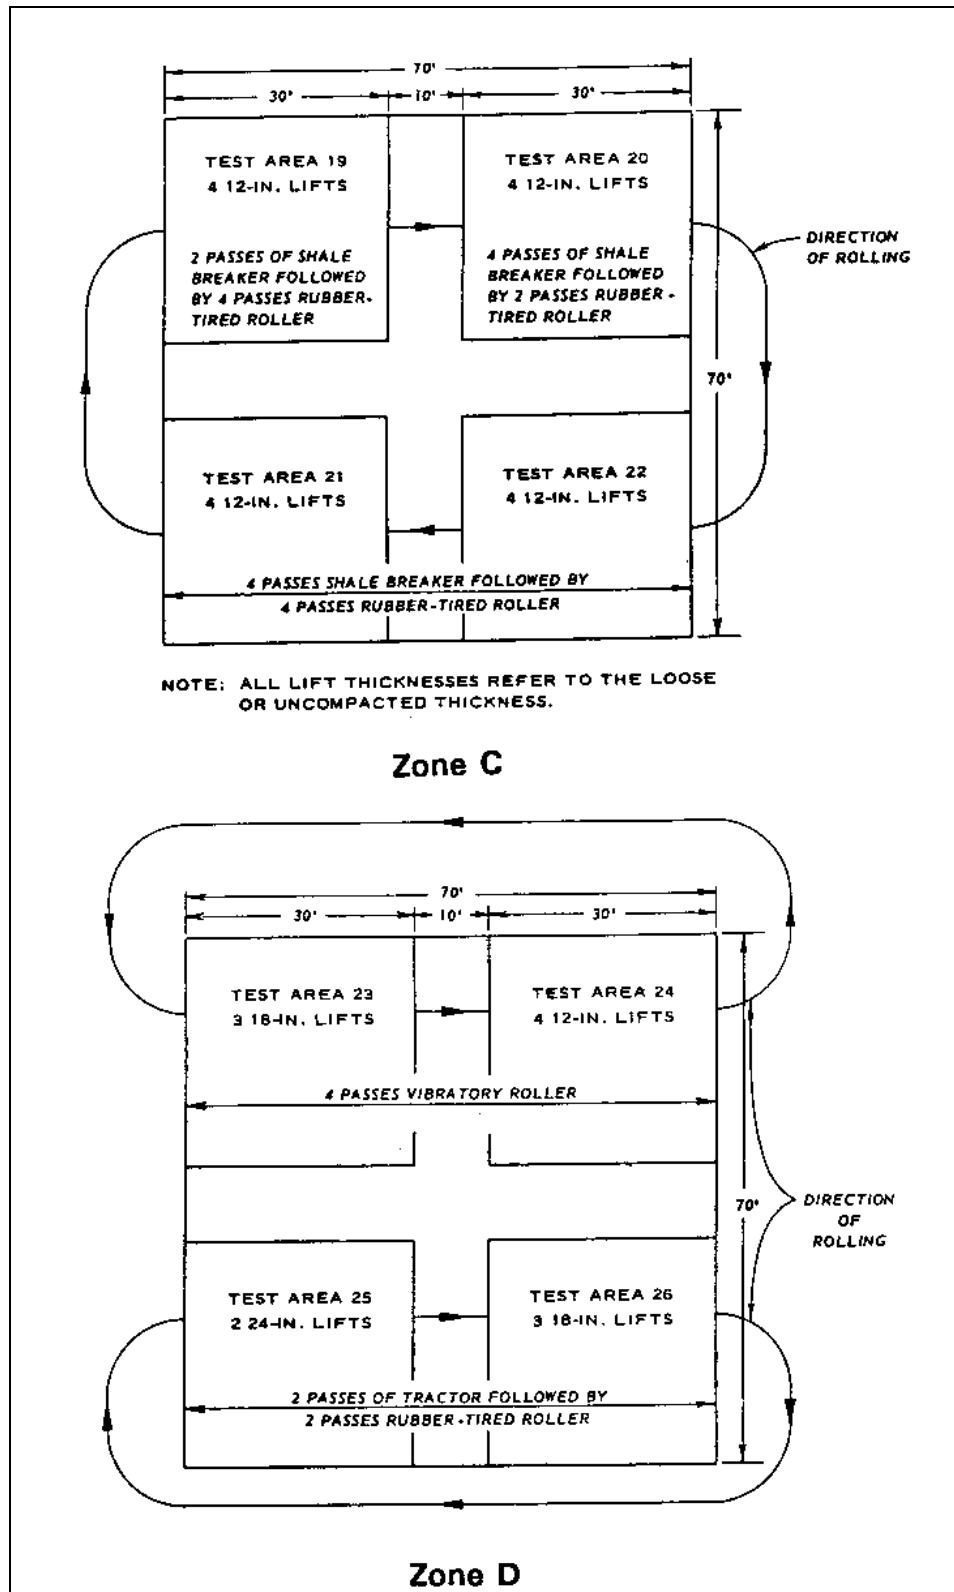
Beltzville Dam, plan view of the rolling pattern
